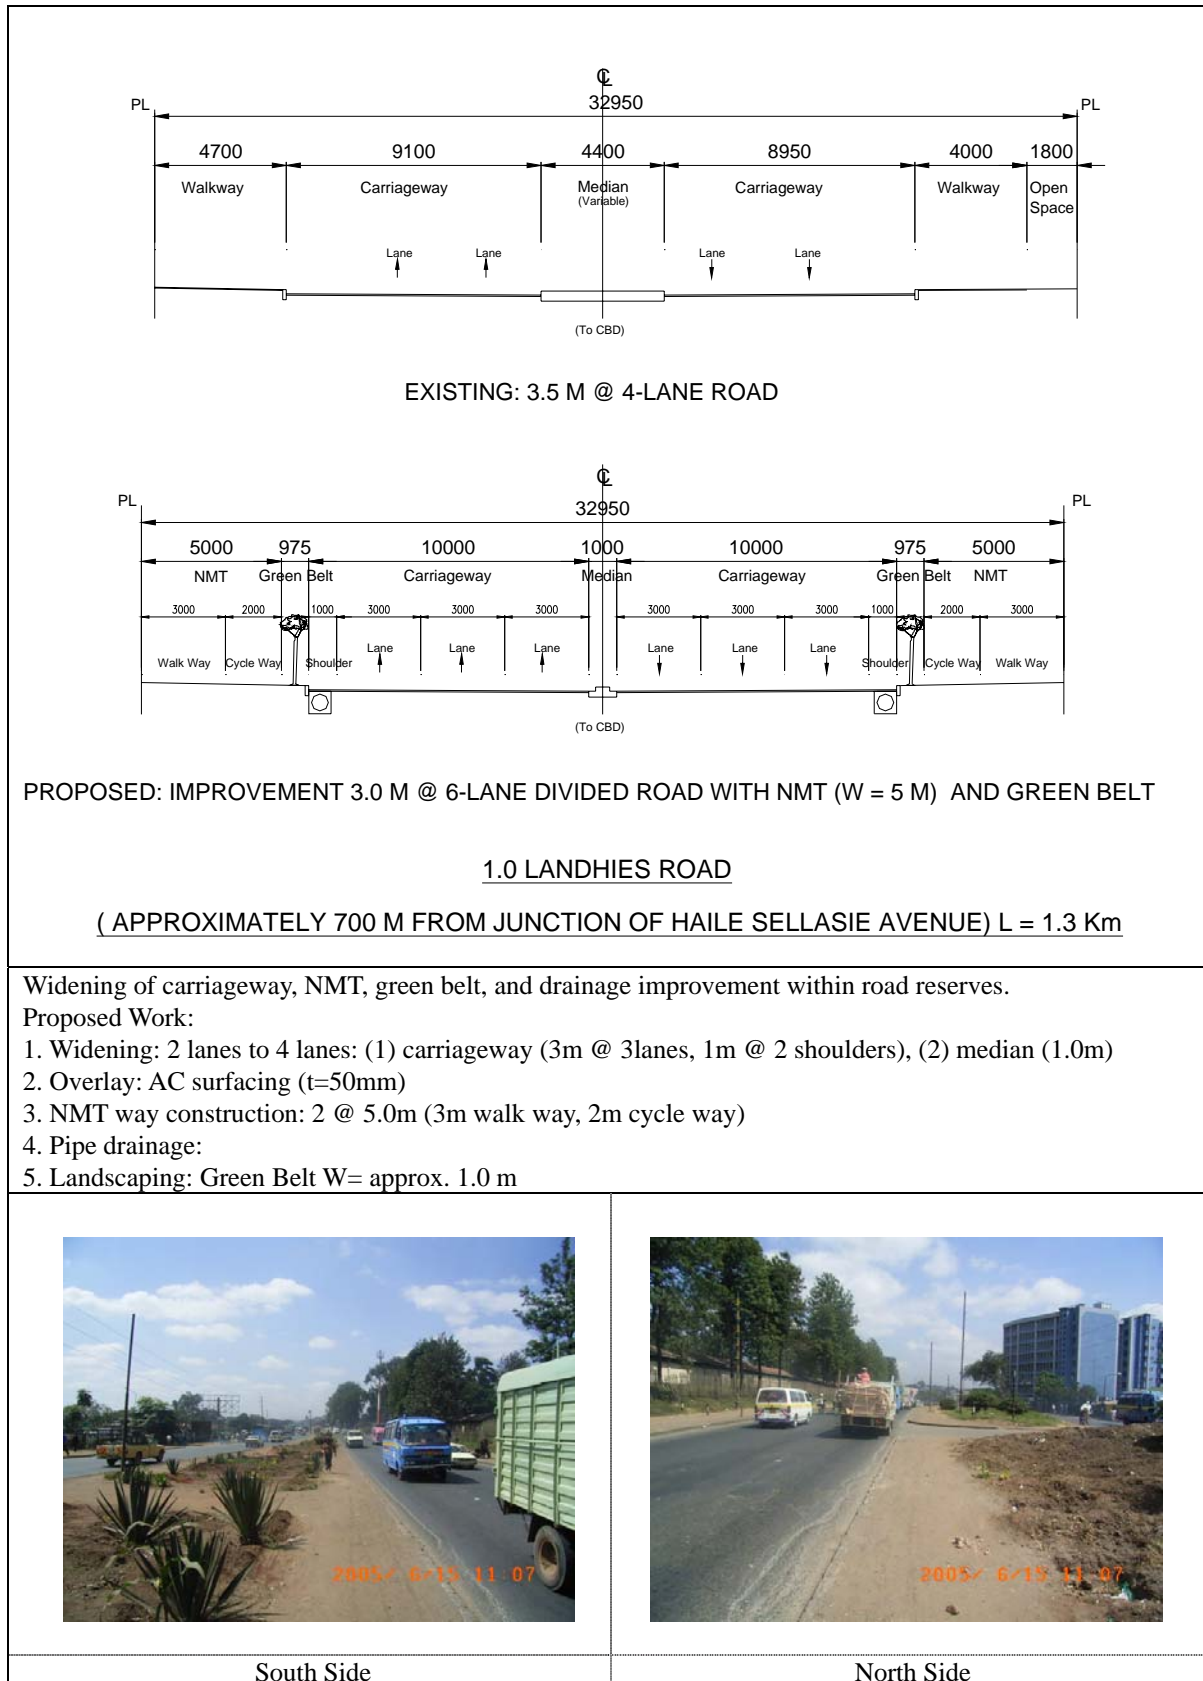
IMPROVEMENT OF LANDHIES ROAD
